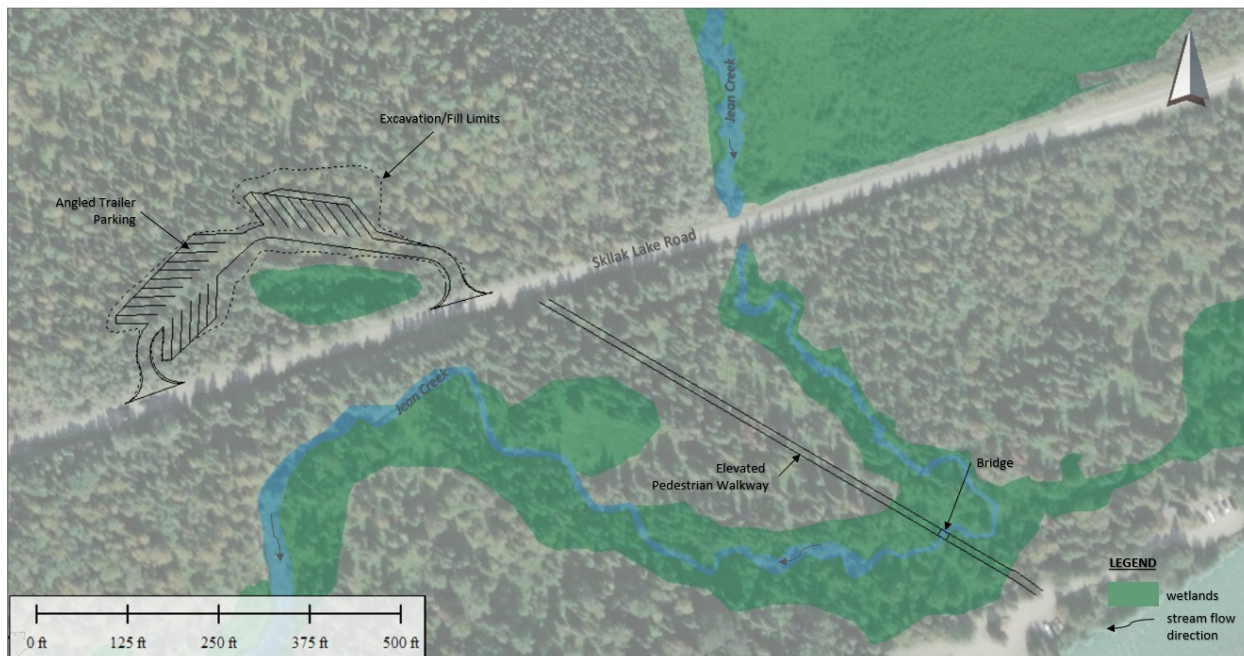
View of Off-site Parking Option 2 with elevated pedestrian walkway and bridge.
